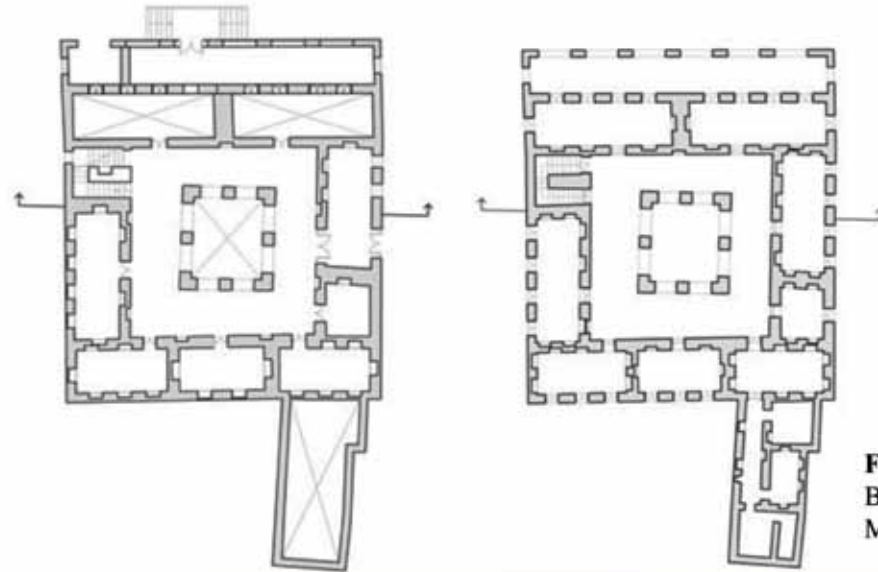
Floor Plan of Bait Al-Khandaq in Hujrat Msalmat.
